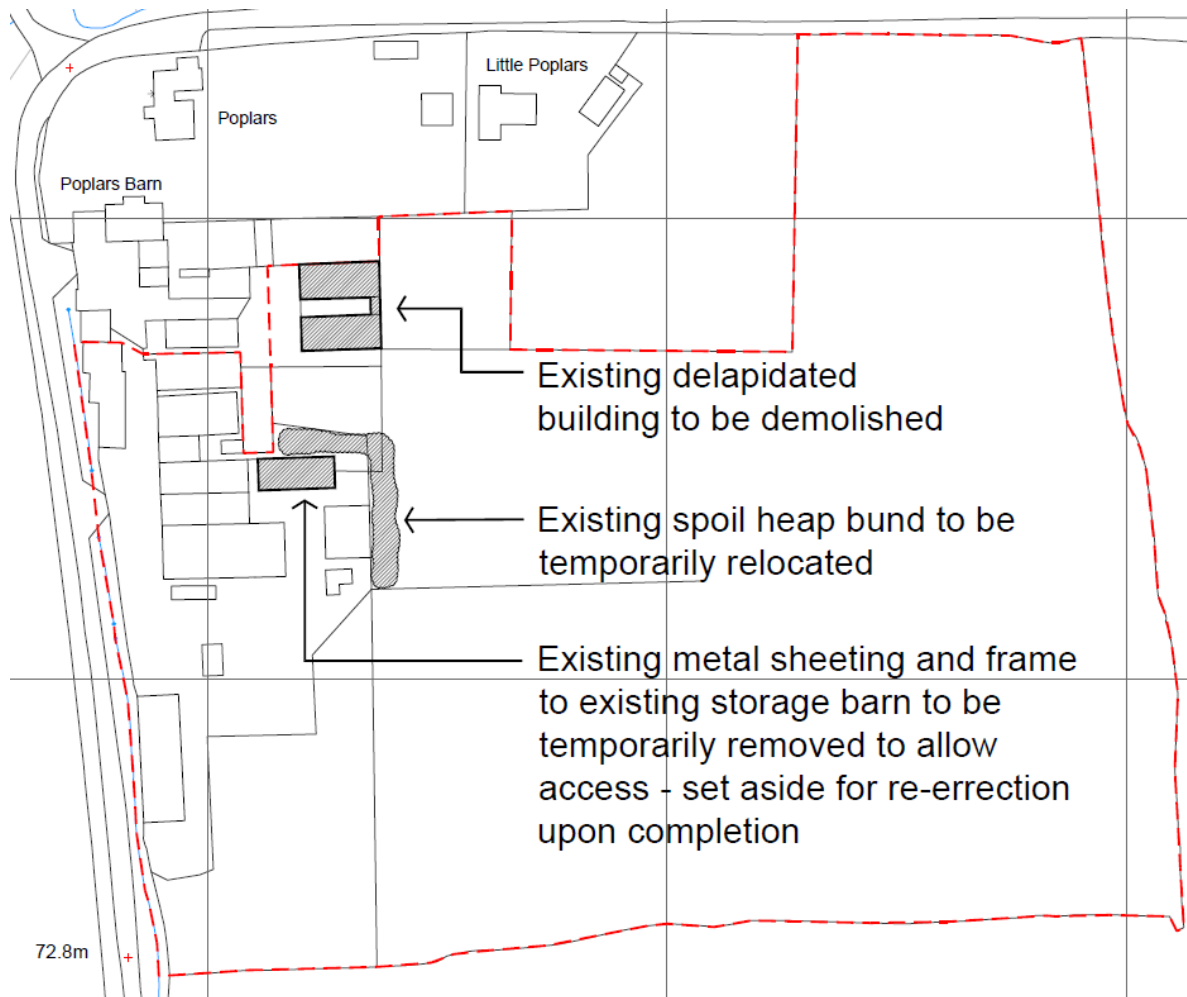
Historic site plan, historic scheme with removed building and bund.
